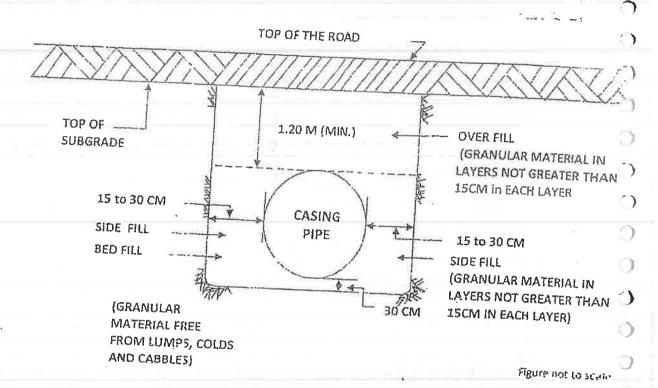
INSTALLATION OF CASING PIPE FOR CROSSING THE ROAD
